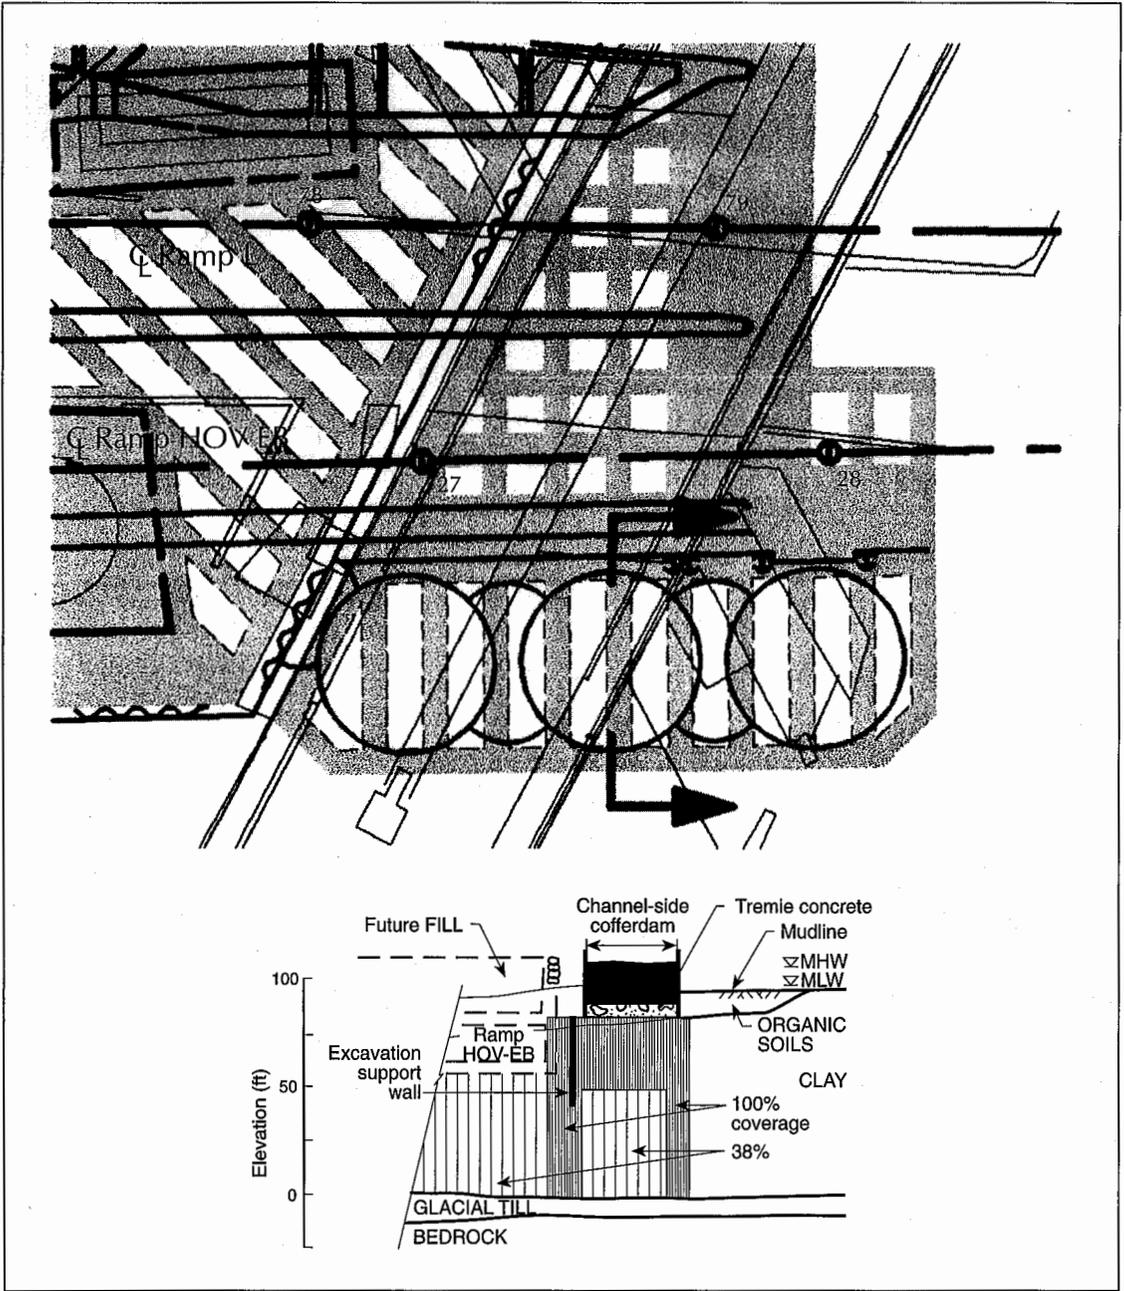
Plan and cross-section of cellular cofferdam on soil-cement for large junction excavation.
